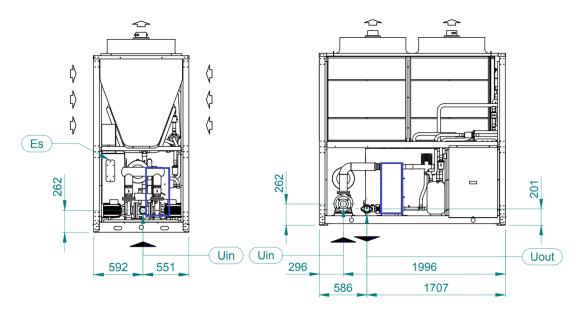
Chiller's dimensions in millimetres (evaporator highlighted in blue), taken from [25]
